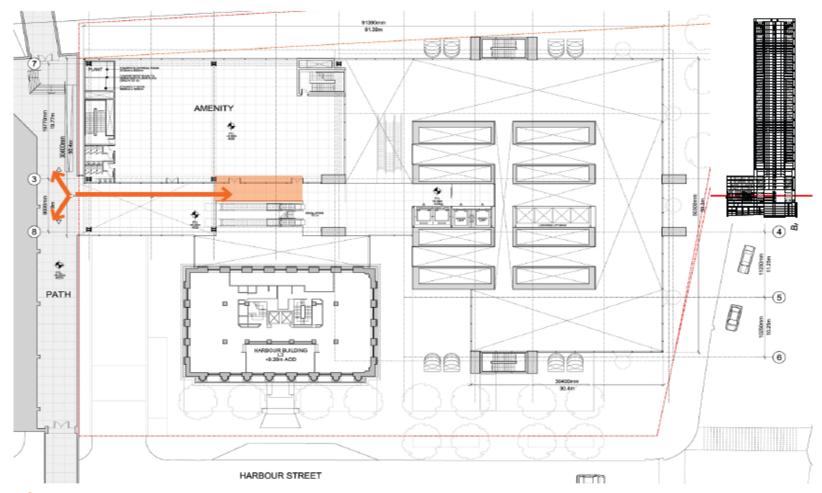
30 Bay Street Level 3 plan - connection to the PATH network
